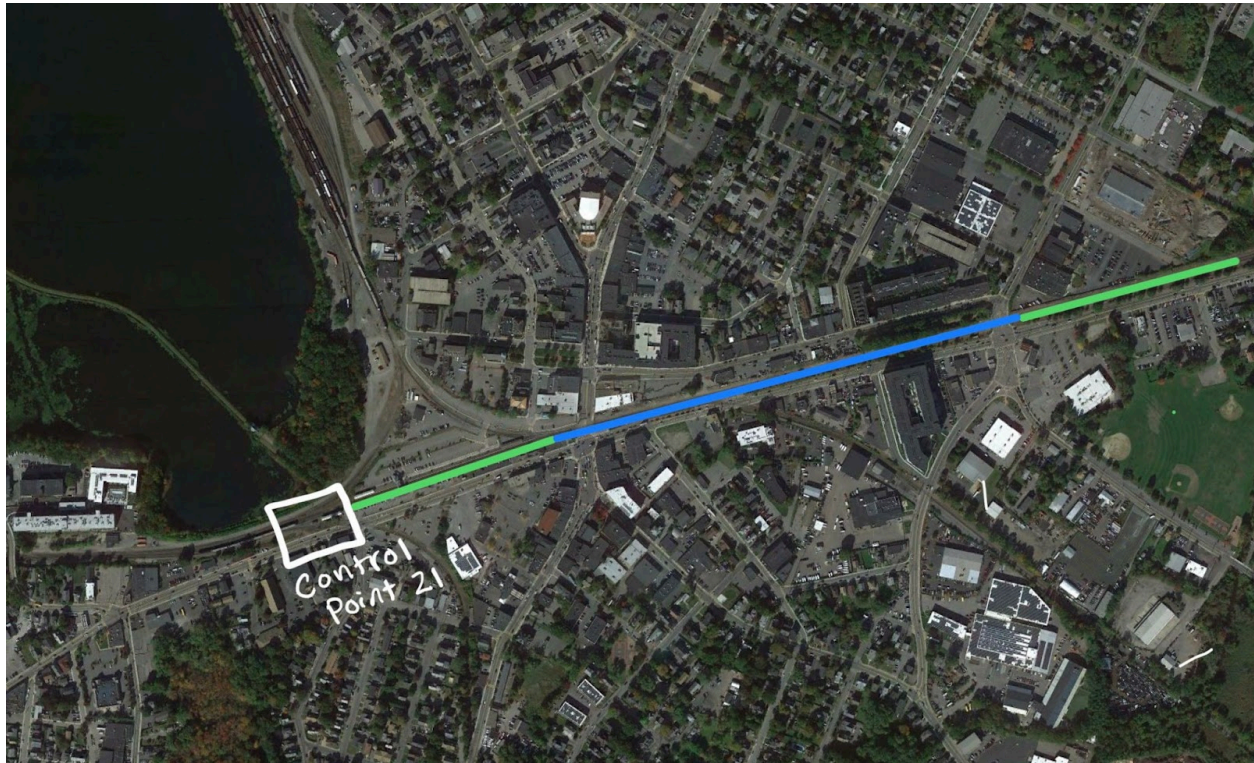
Grade Separation Layout. Green lines indicate 1,000-foot track elevation sections and blue lines represent elevated, zero-percent slope track sections.
